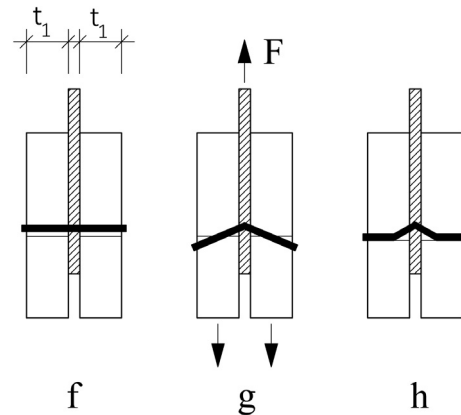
Failure modes for timber joints with slotted-in steel plates [2].
